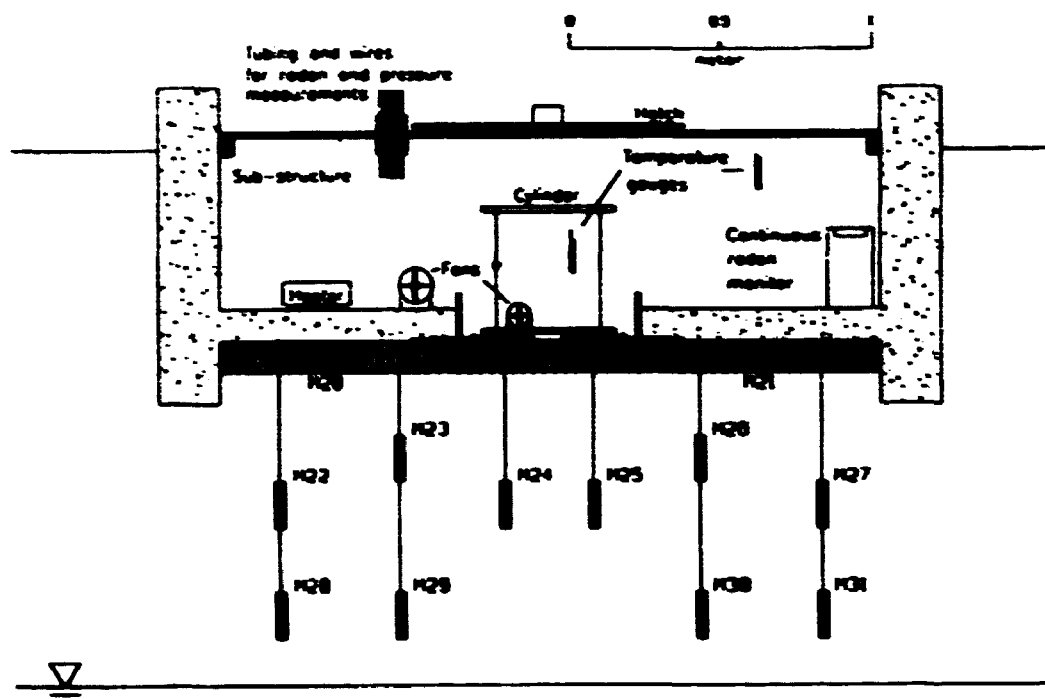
Cross-sectional view of the new test structure. Probes located below the slab are named M20 to M31.
